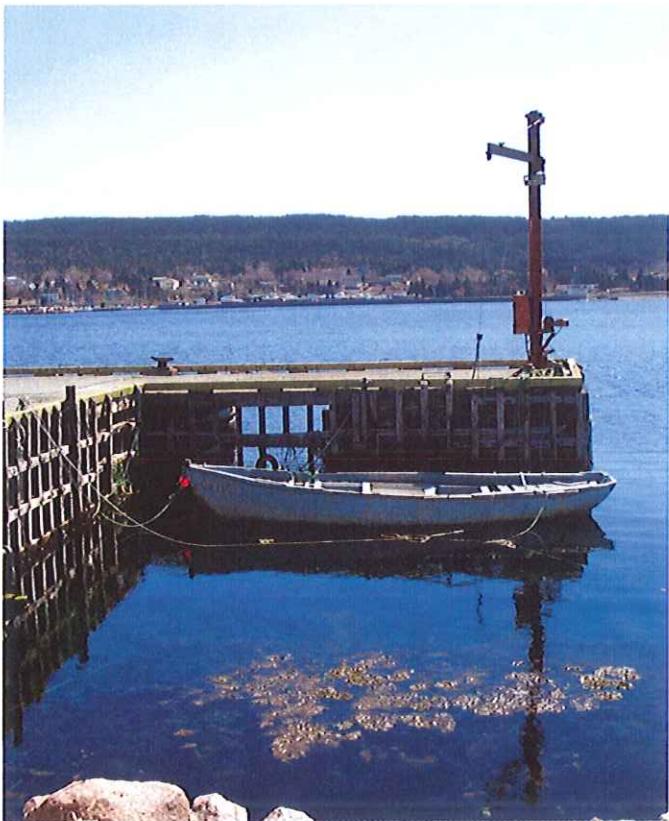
Shoreline and neighbouring fish plant at southeast corner of subject property.
